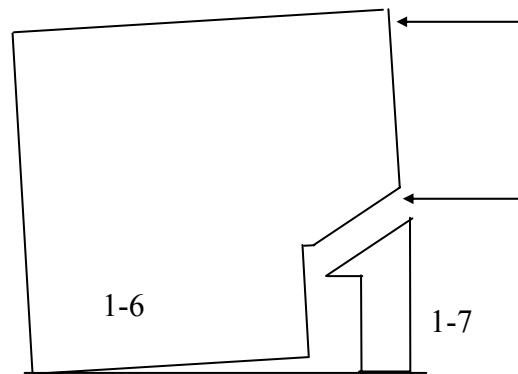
Rocking of Wall 1 when loaded in the push direction (southward)
